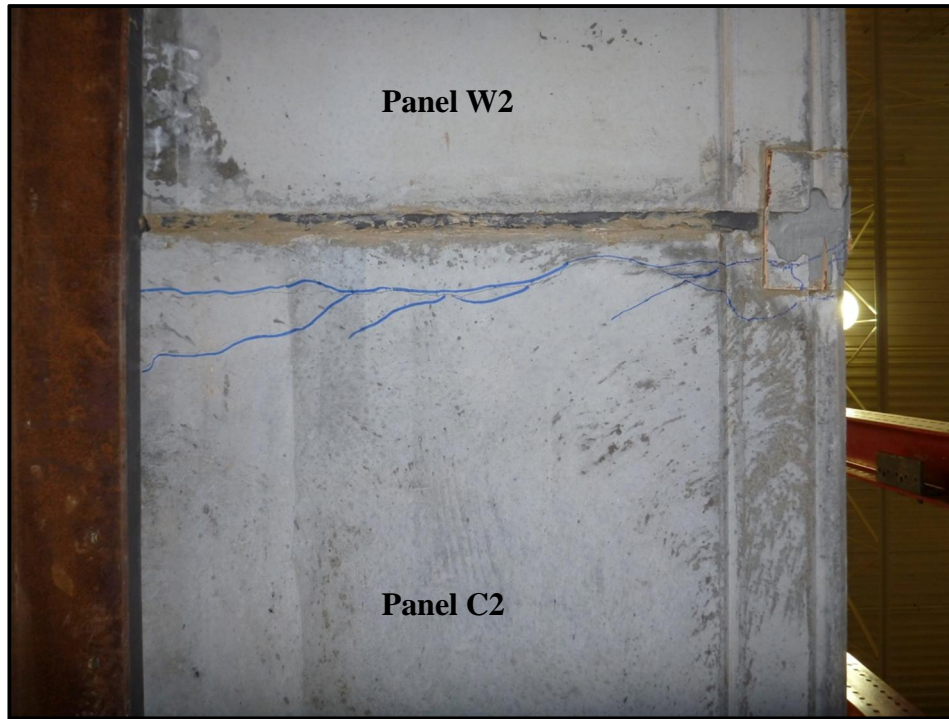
Typical Cracks on Overhang Soffit (Test #3)
